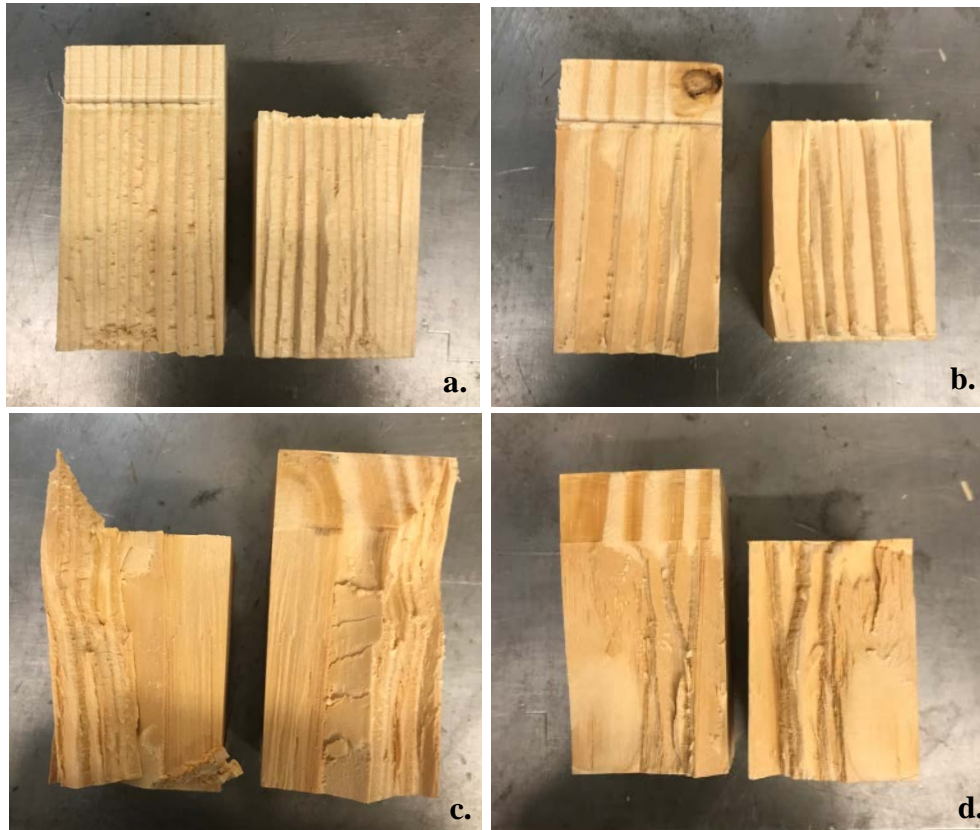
Examples of shear test specimens post-test, (a, b) SPF-S specimens, (c,d) SYP specimens.
